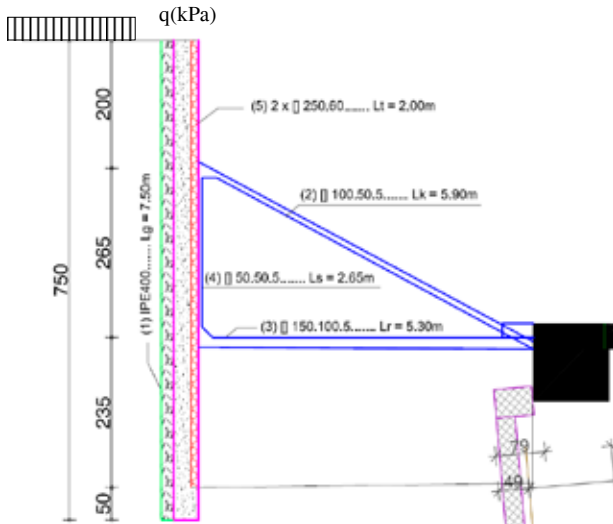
Site location No.1 with RW as soldier H piles with lagging.
